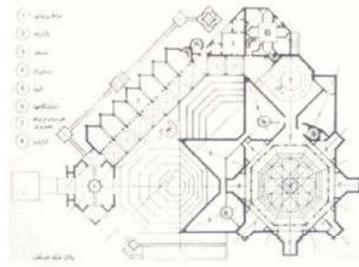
Niavaran Cultural Center, First Floor Plan [9]
